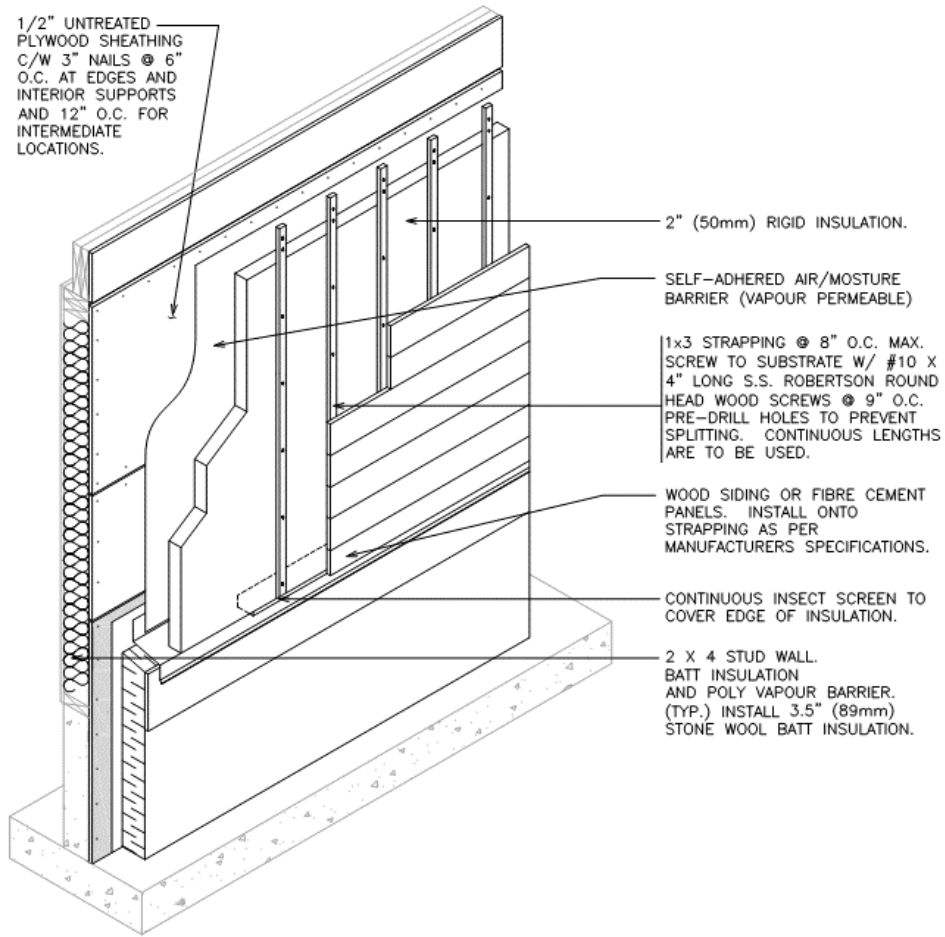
ABOVE CODE EXTERIOR WALL [11]
